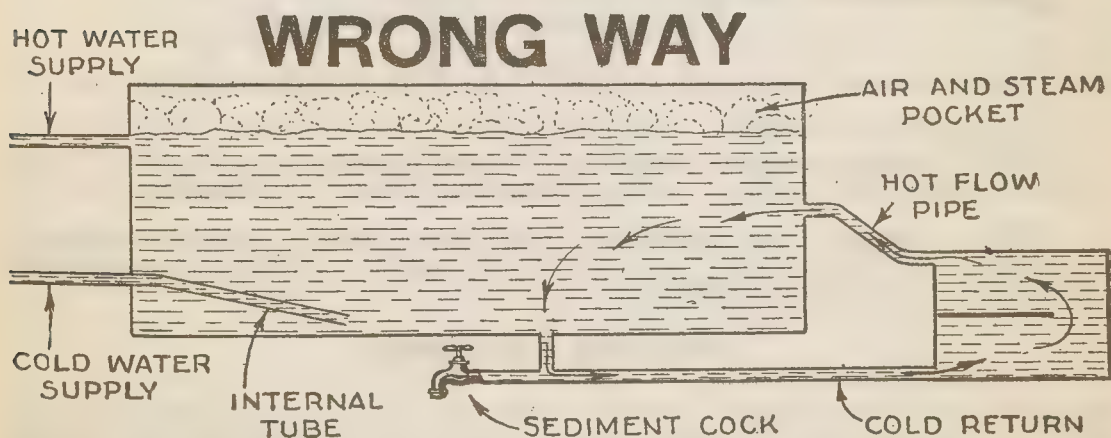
,635.—*Wrong way* of connecting vertical tank used as a horizontal tank. *Note* large air and steam pocket formed because the hot water supply is not taken from the top.
